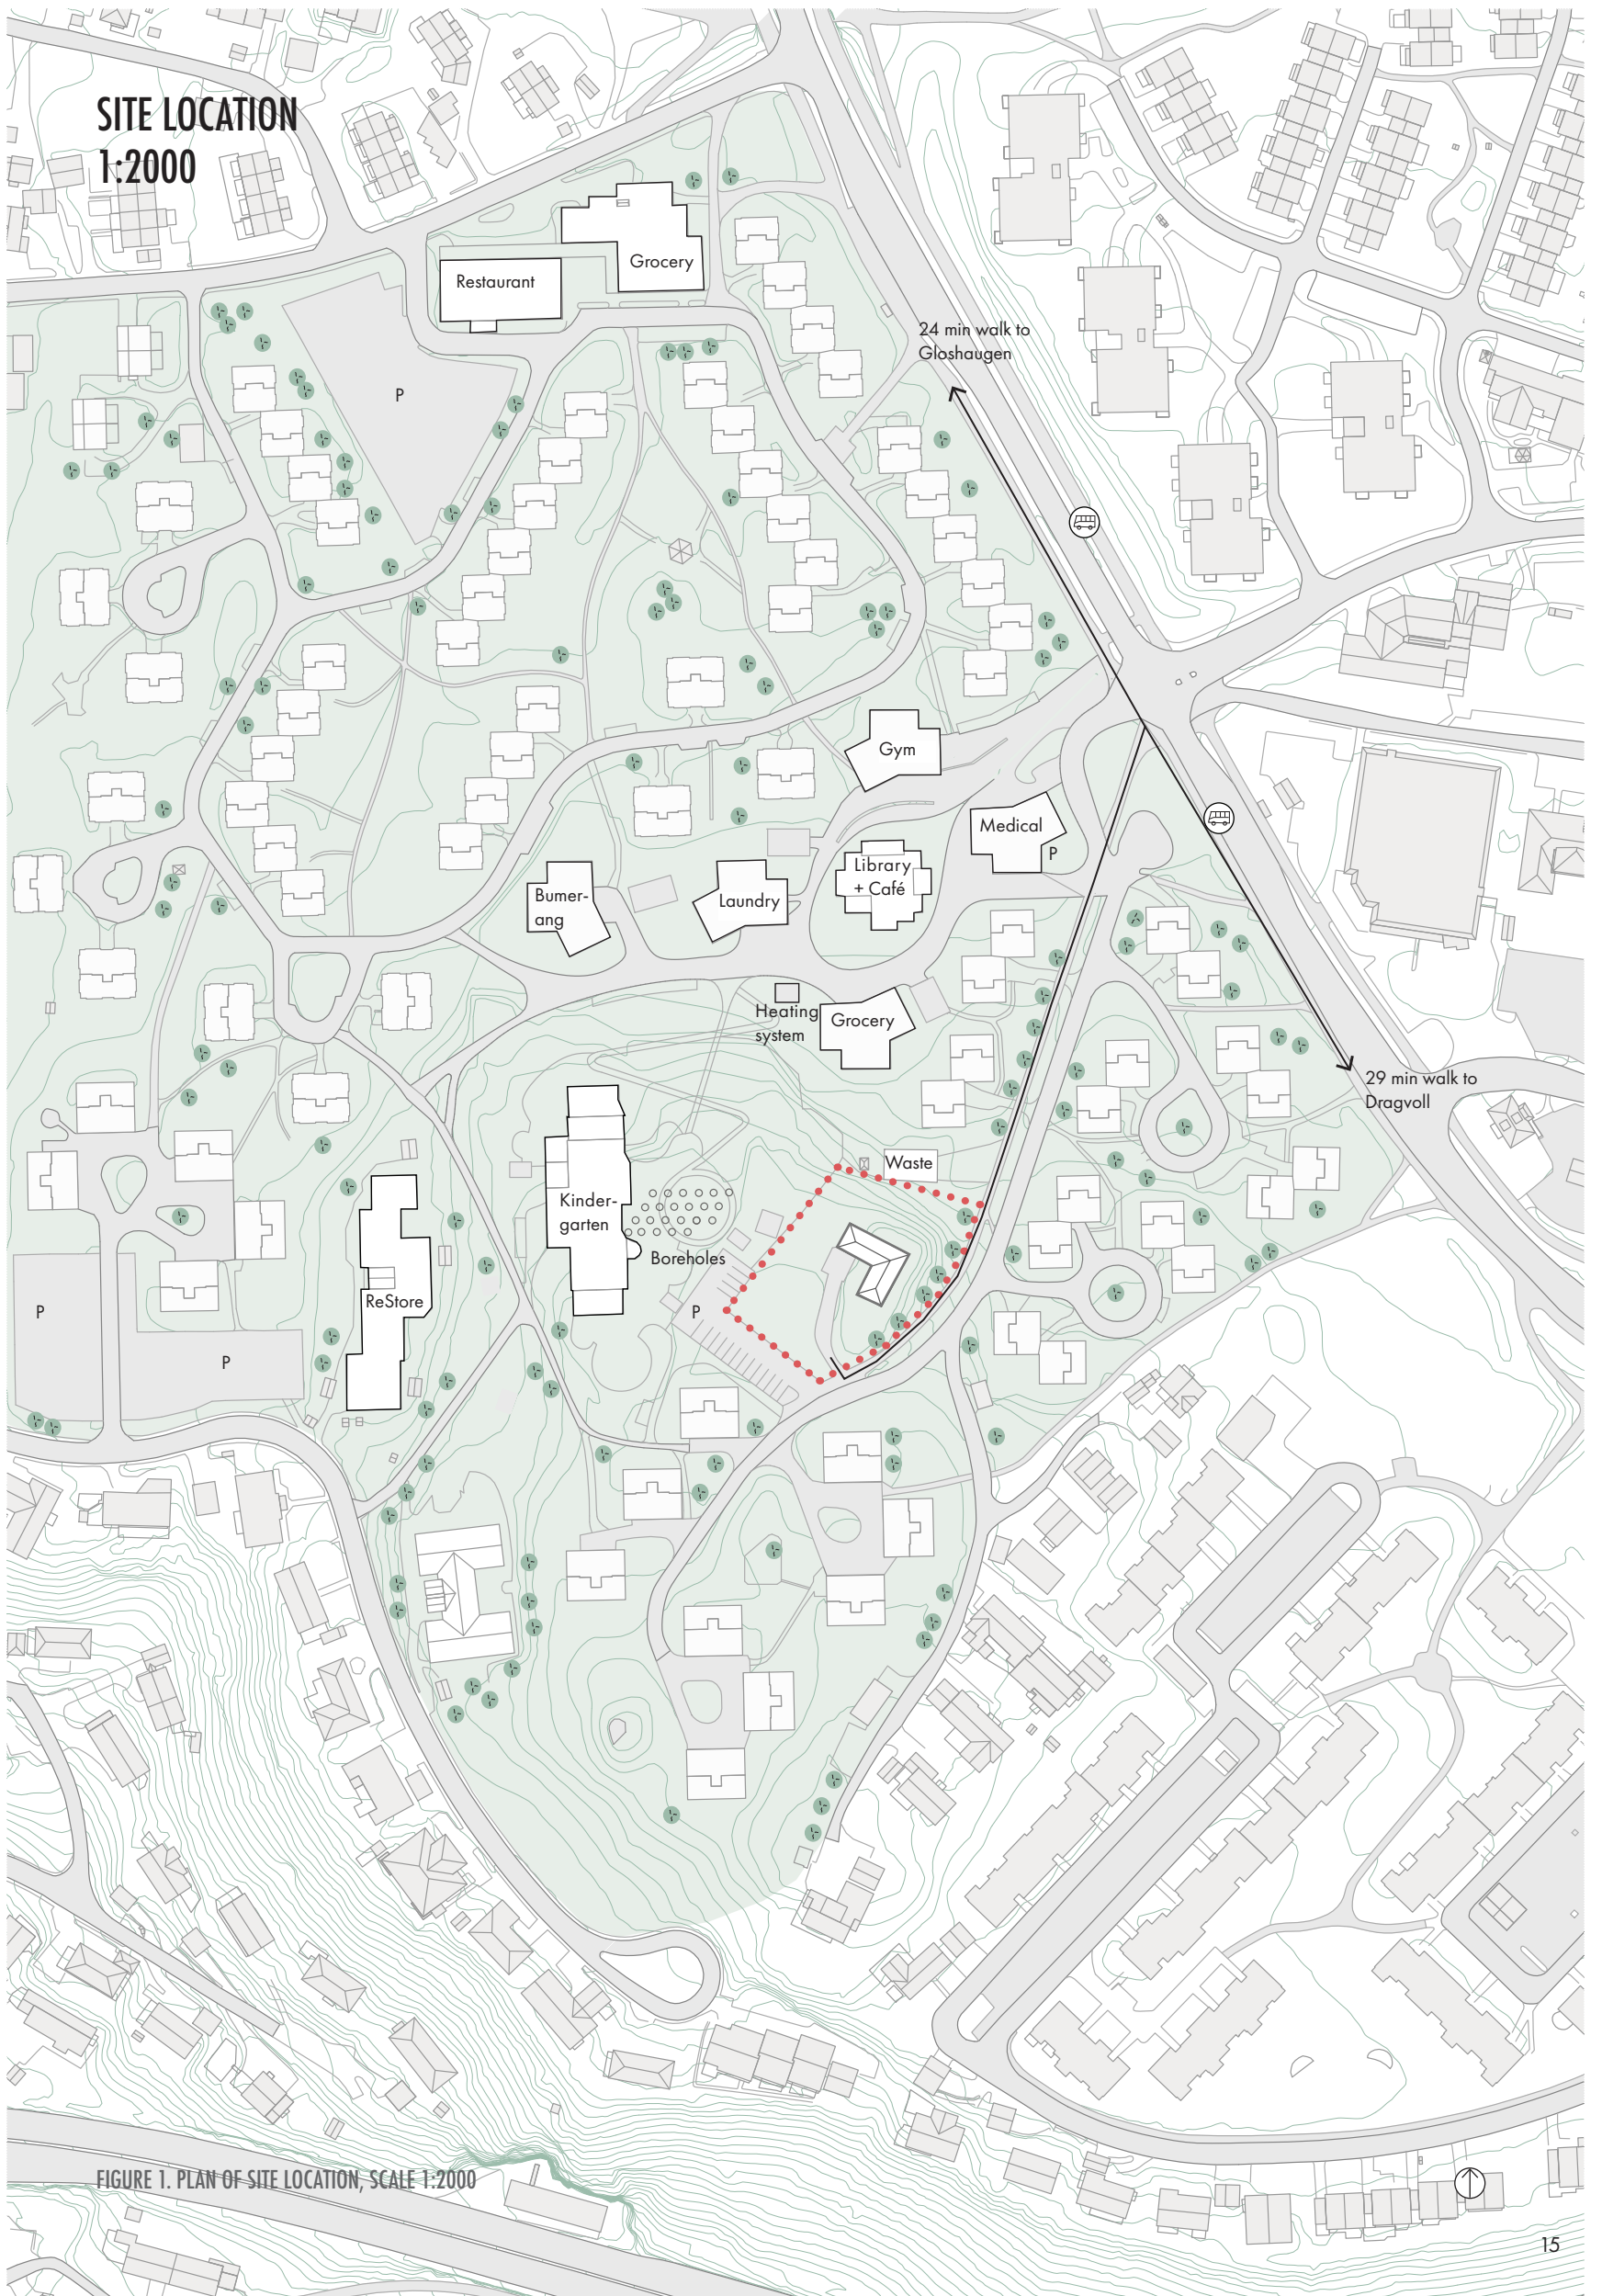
PLAN OF SITE LOCATION, SCALE 1:2000
